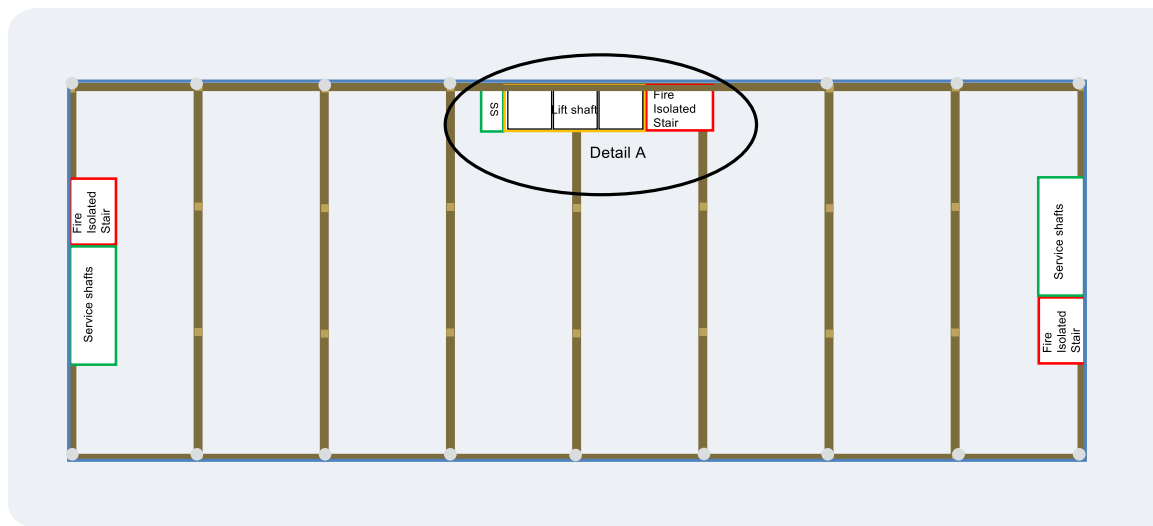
Floor plan section of a commercial building showing cavity barriers in external walls at maximum 10m centres (refer Figure 4.7 for details around the cores and typical window details)
